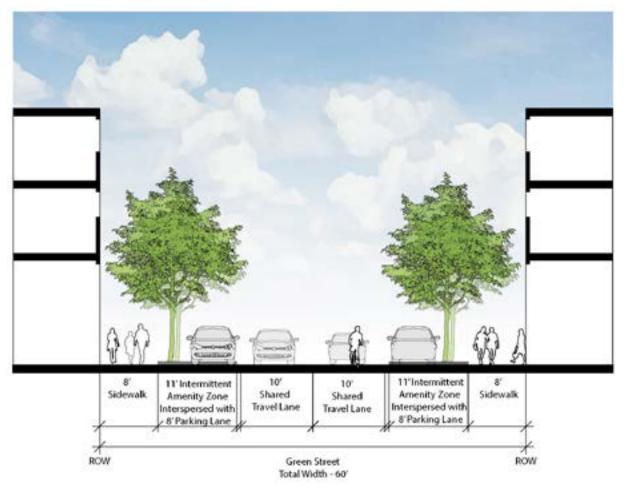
Typical Section for a Green Street. Note: Required on-street parking alternates with expanded landscape areas.
